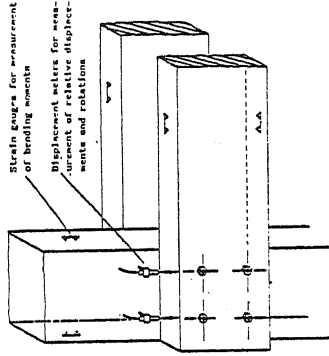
Framed structure: detail of the column-beam joint with measuring instruments.
